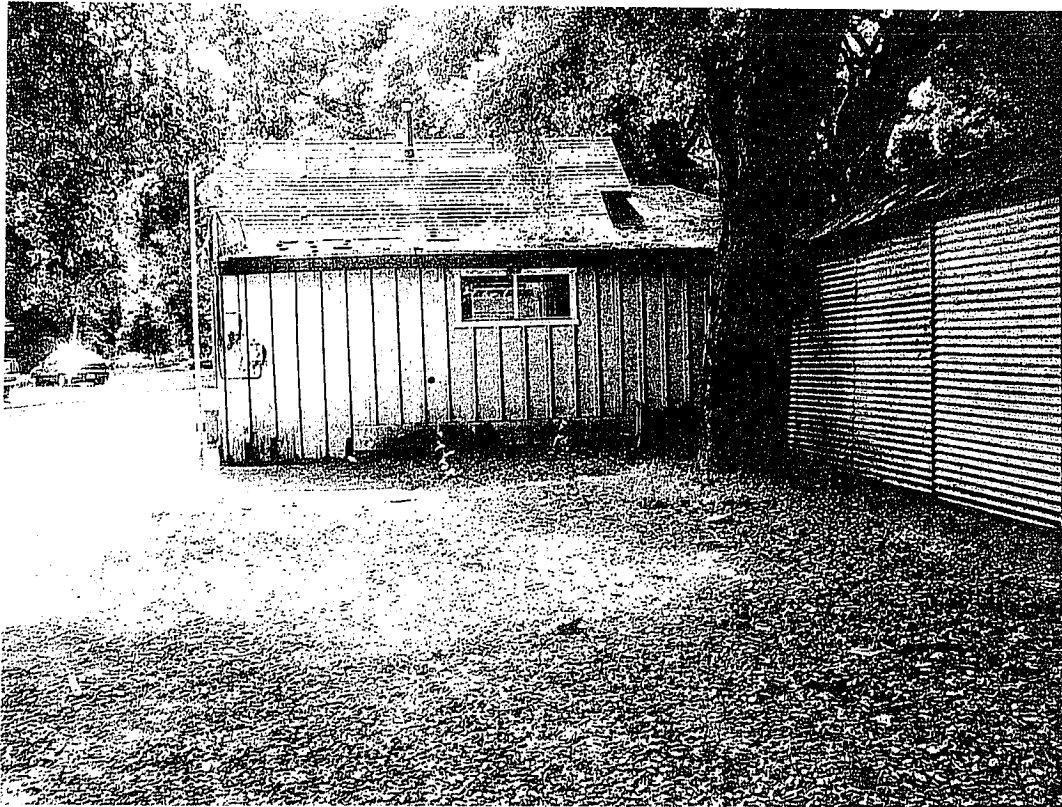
Looking NW at the damage on the east facing facade from the July 23, 2005 hit-and-run incident.
